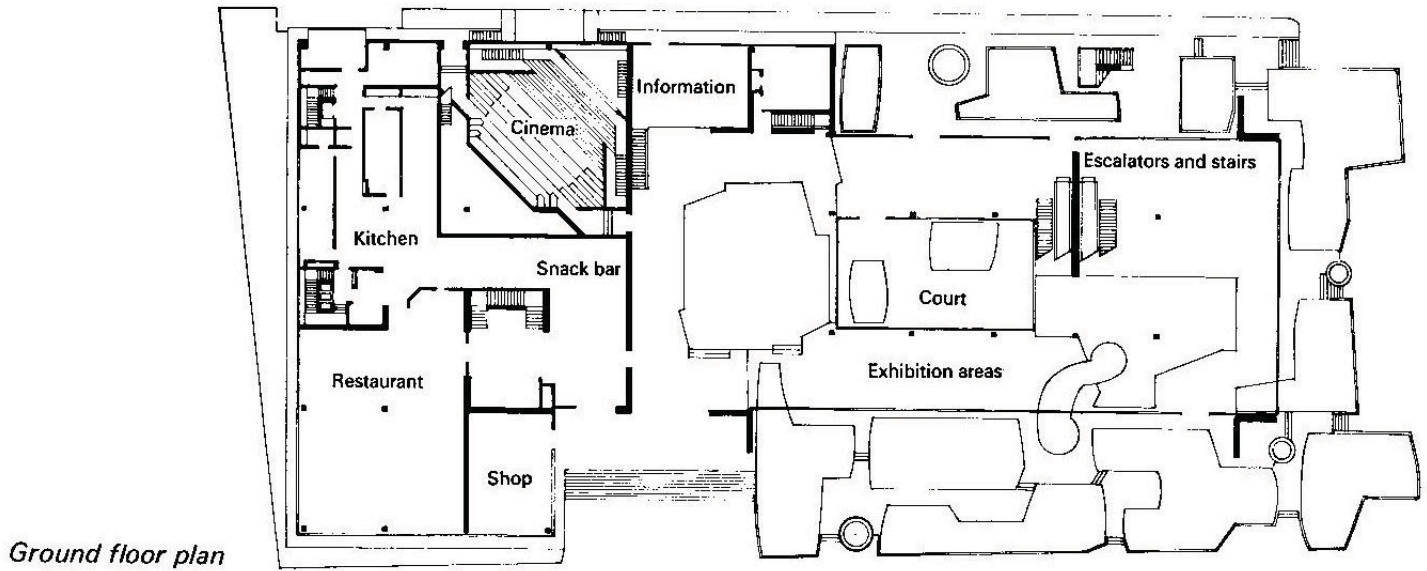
Czechoslovakia Pavilion, Ground Floor Plan
